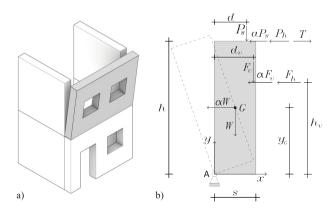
Simple overturning of a single-story wall: (a) sketch of the collapse mechanism and (b) geometry, boundary, and loading conditions of the mechanical model.
